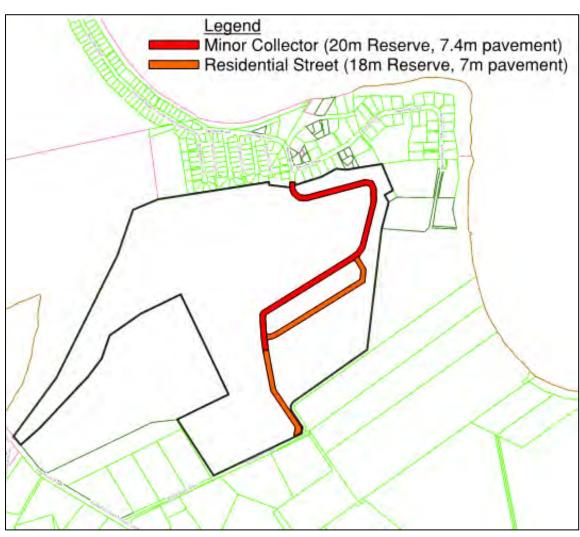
Proposed Map F17.0, 52 Richardsons Road Specific Area Plan (source for base image: LISTmap accessed 13/7/2020).
